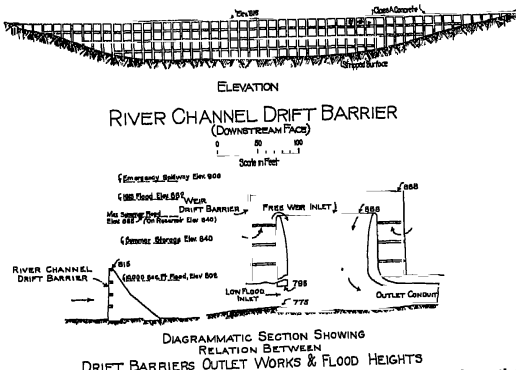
Proposed drift barriers for the Dublin dam, to protect the outlets against drift that might cause clogging
